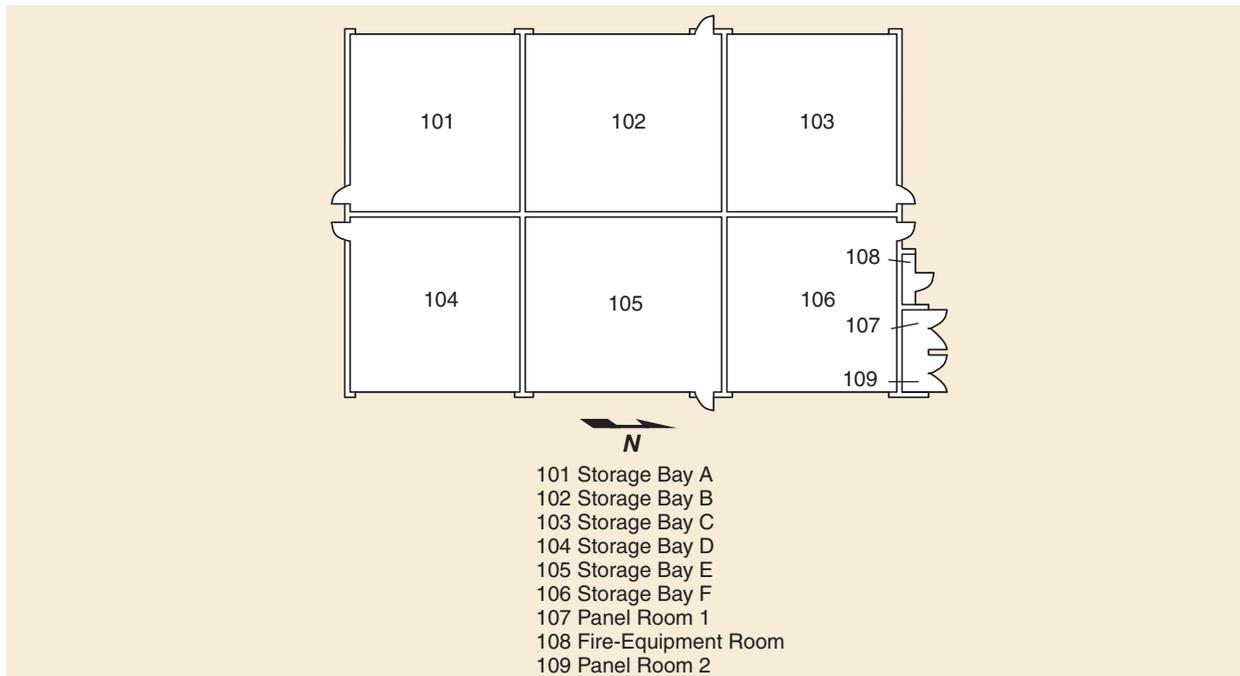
Building 3 Detailed Floor Plan, Astrotech
